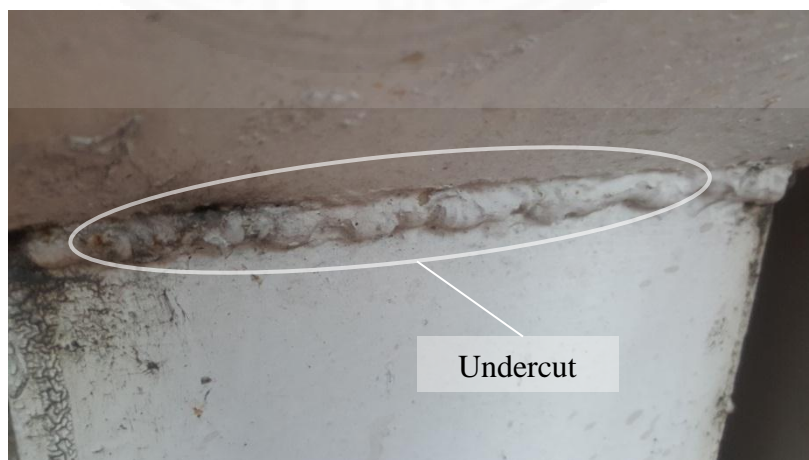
Welding defects on Steel Structure B (joint 7)
